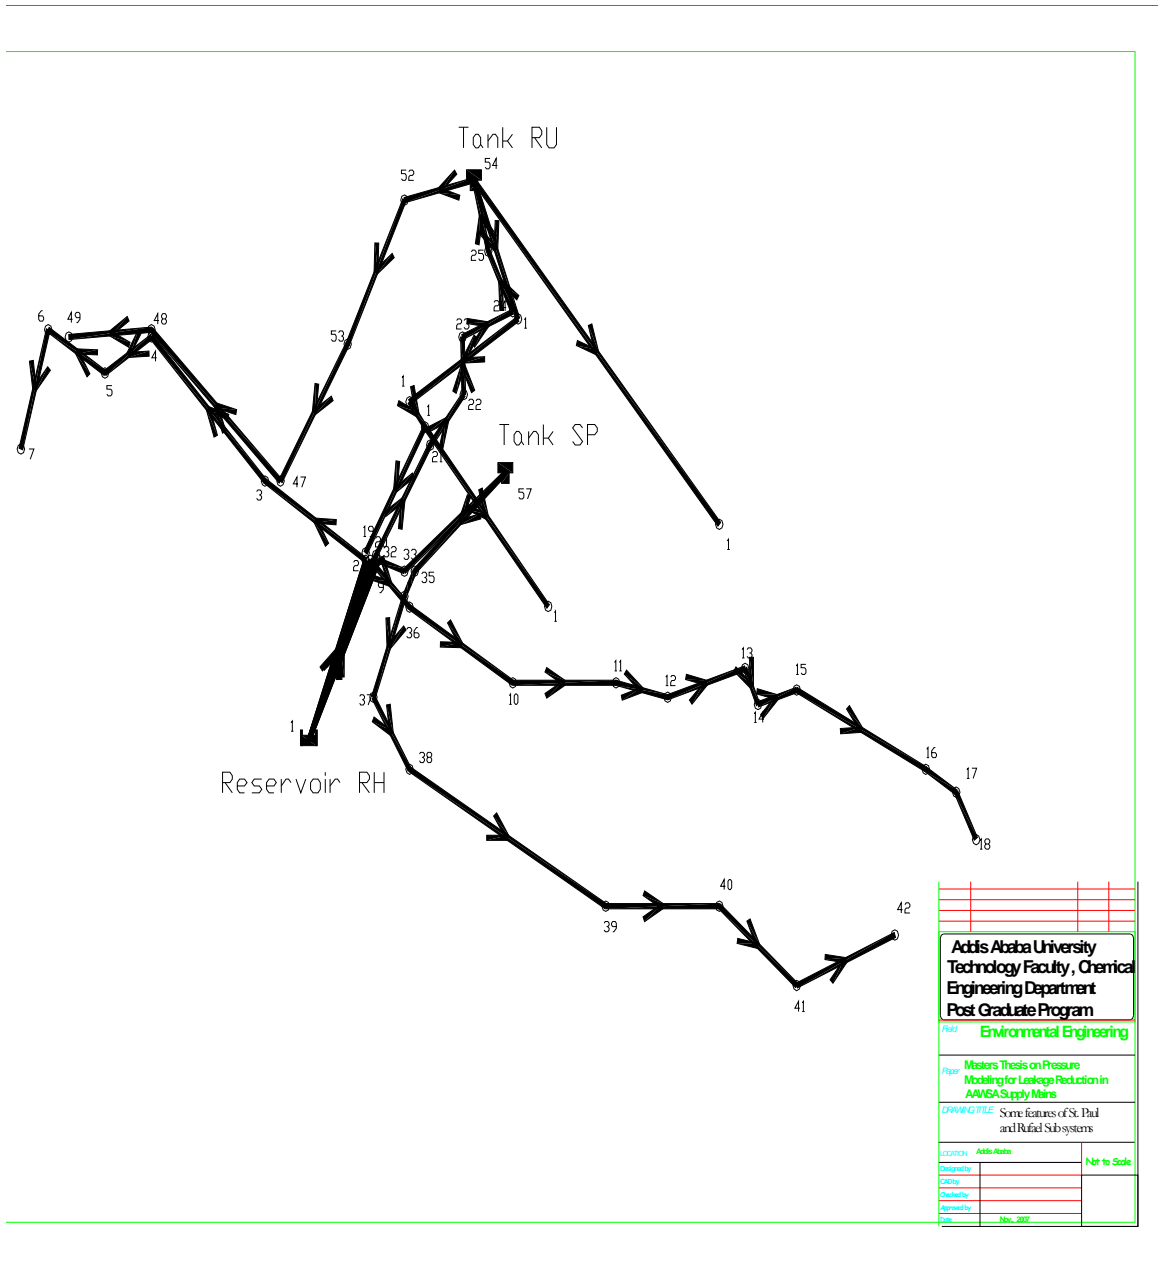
The skeleton of the pipe layout in AAWSA supply system
